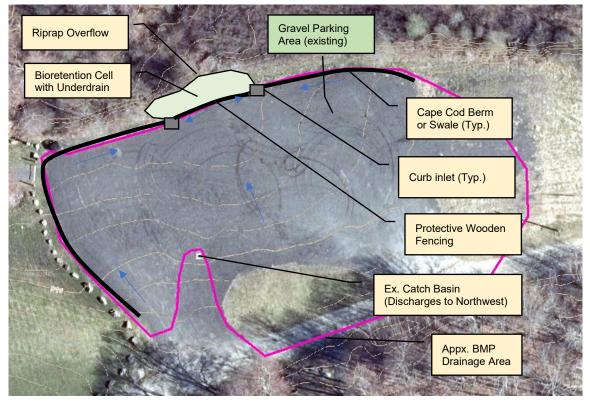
Proposed BMP configuration for gravel-surfaced parking area.
